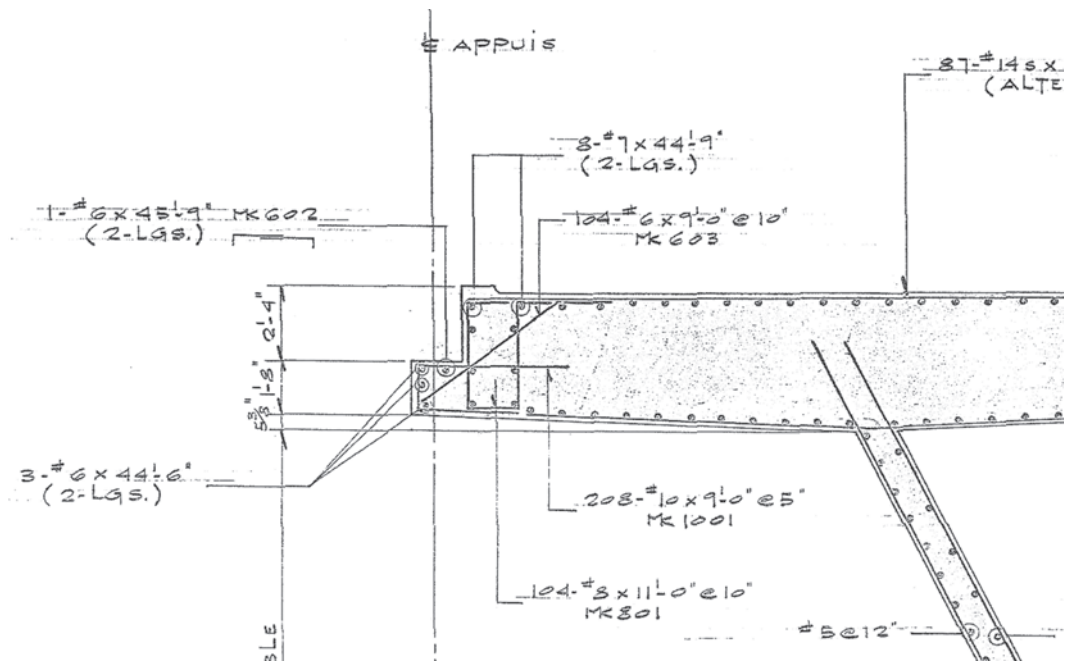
Layout of the Reinforcing Bars in the Cantilever of the East Abutment (Excerpted from the As Designed Drawings)
